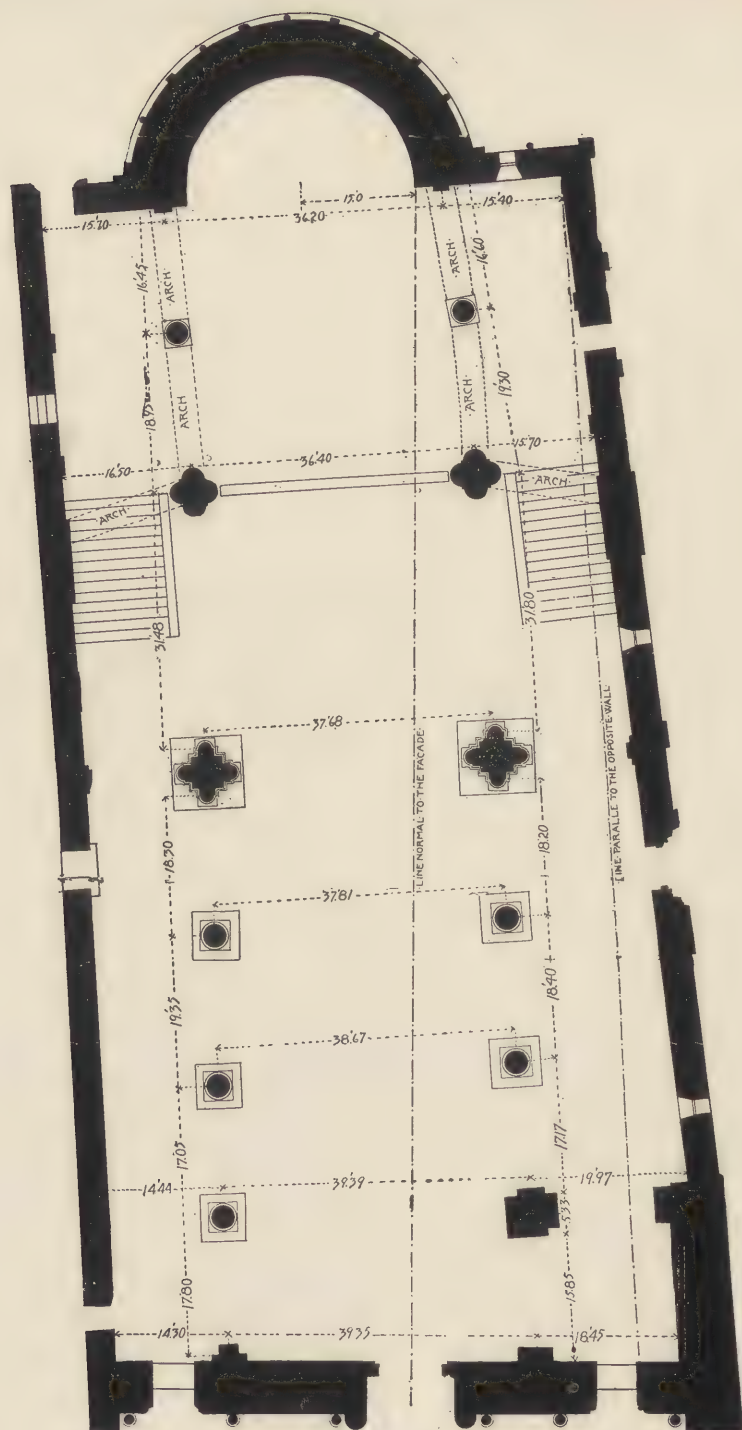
GROUND PLAN OF S. MARIA DELLA PIEVE AT AREZZO.
